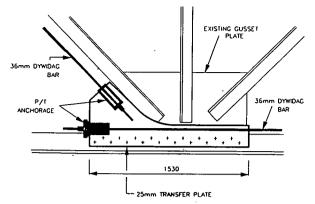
Burlington Skyway, post-tensioning transfer plate details (101).
